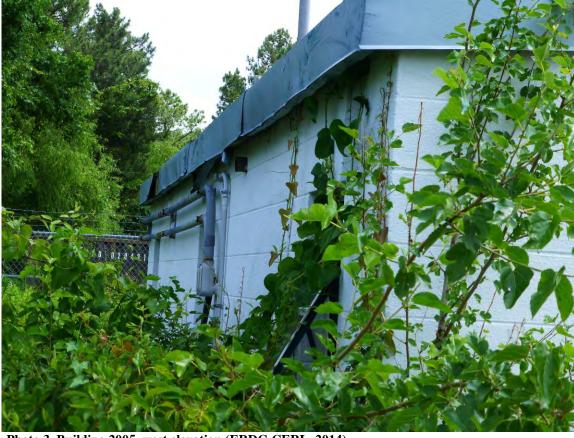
Building 2005, west elevation (ERDC-CERL, 2014).
